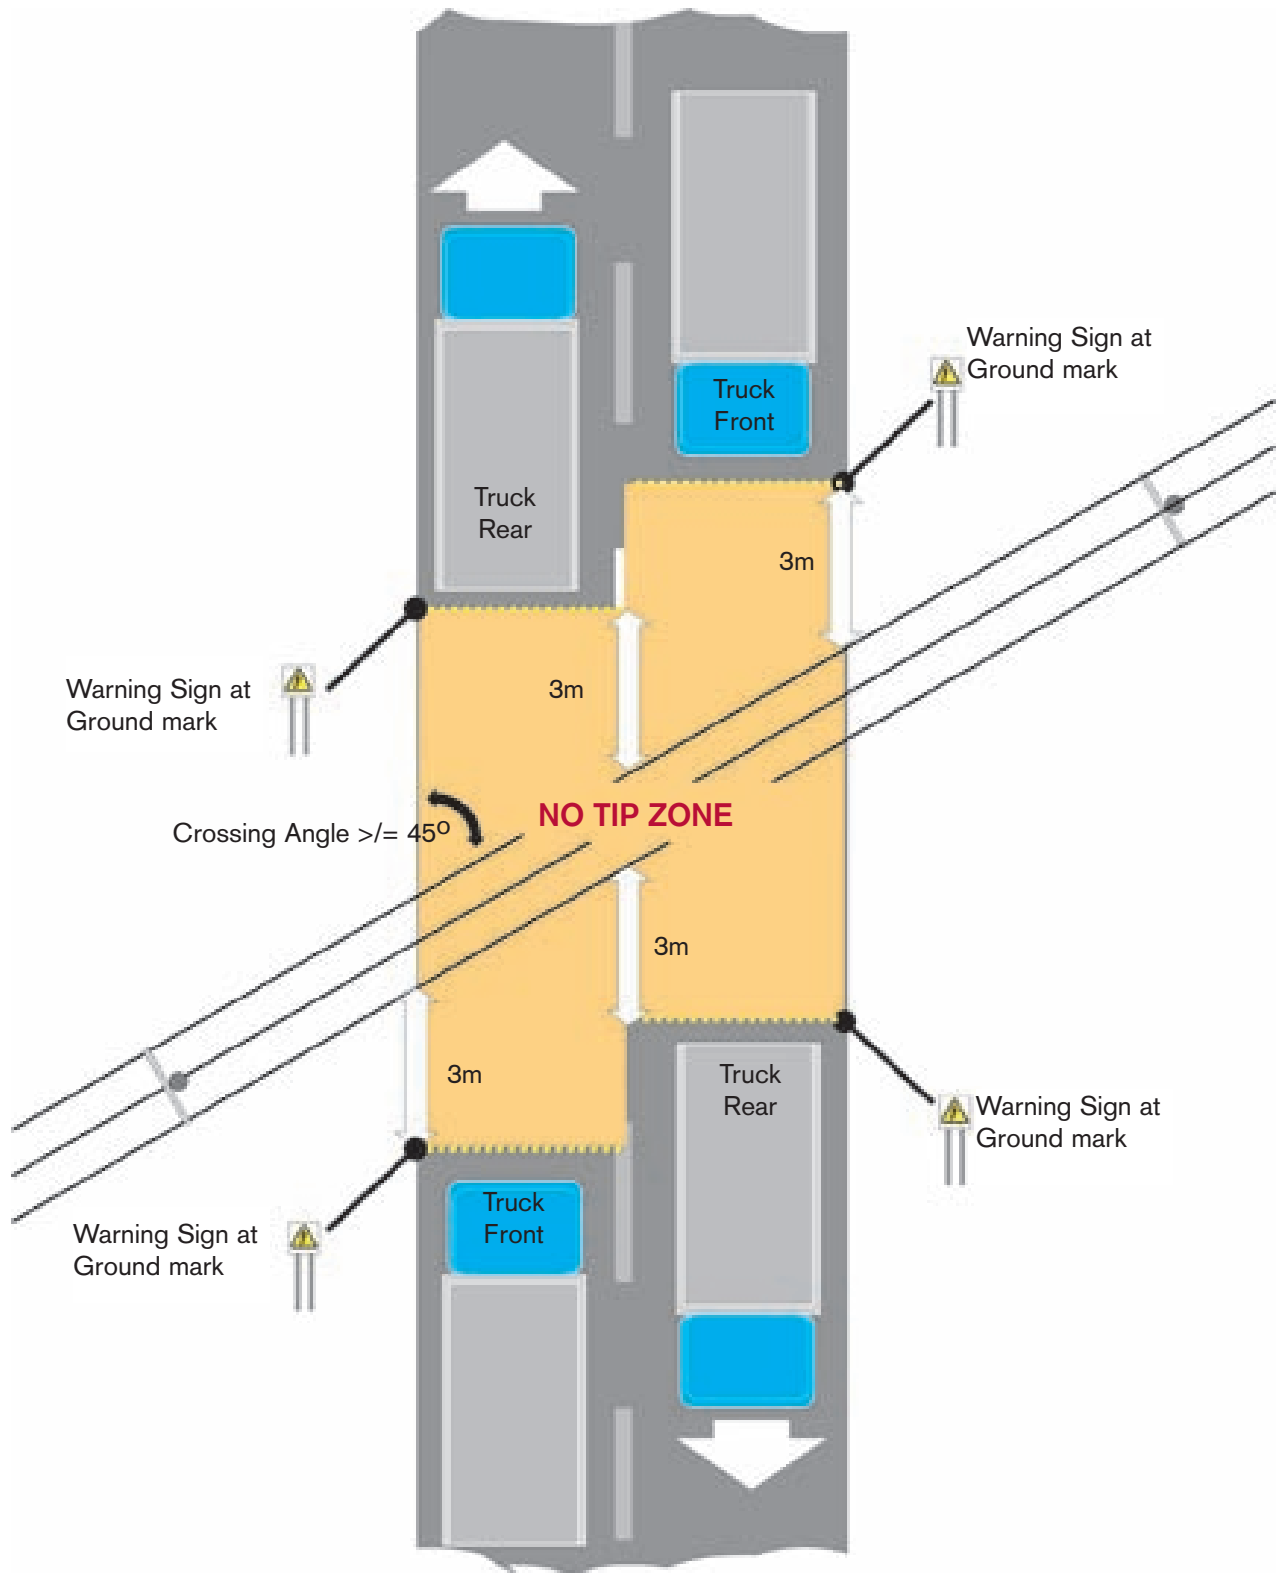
Safe System of Work for road resurfacing only where crossing angle is ≥ 45 degrees with road
